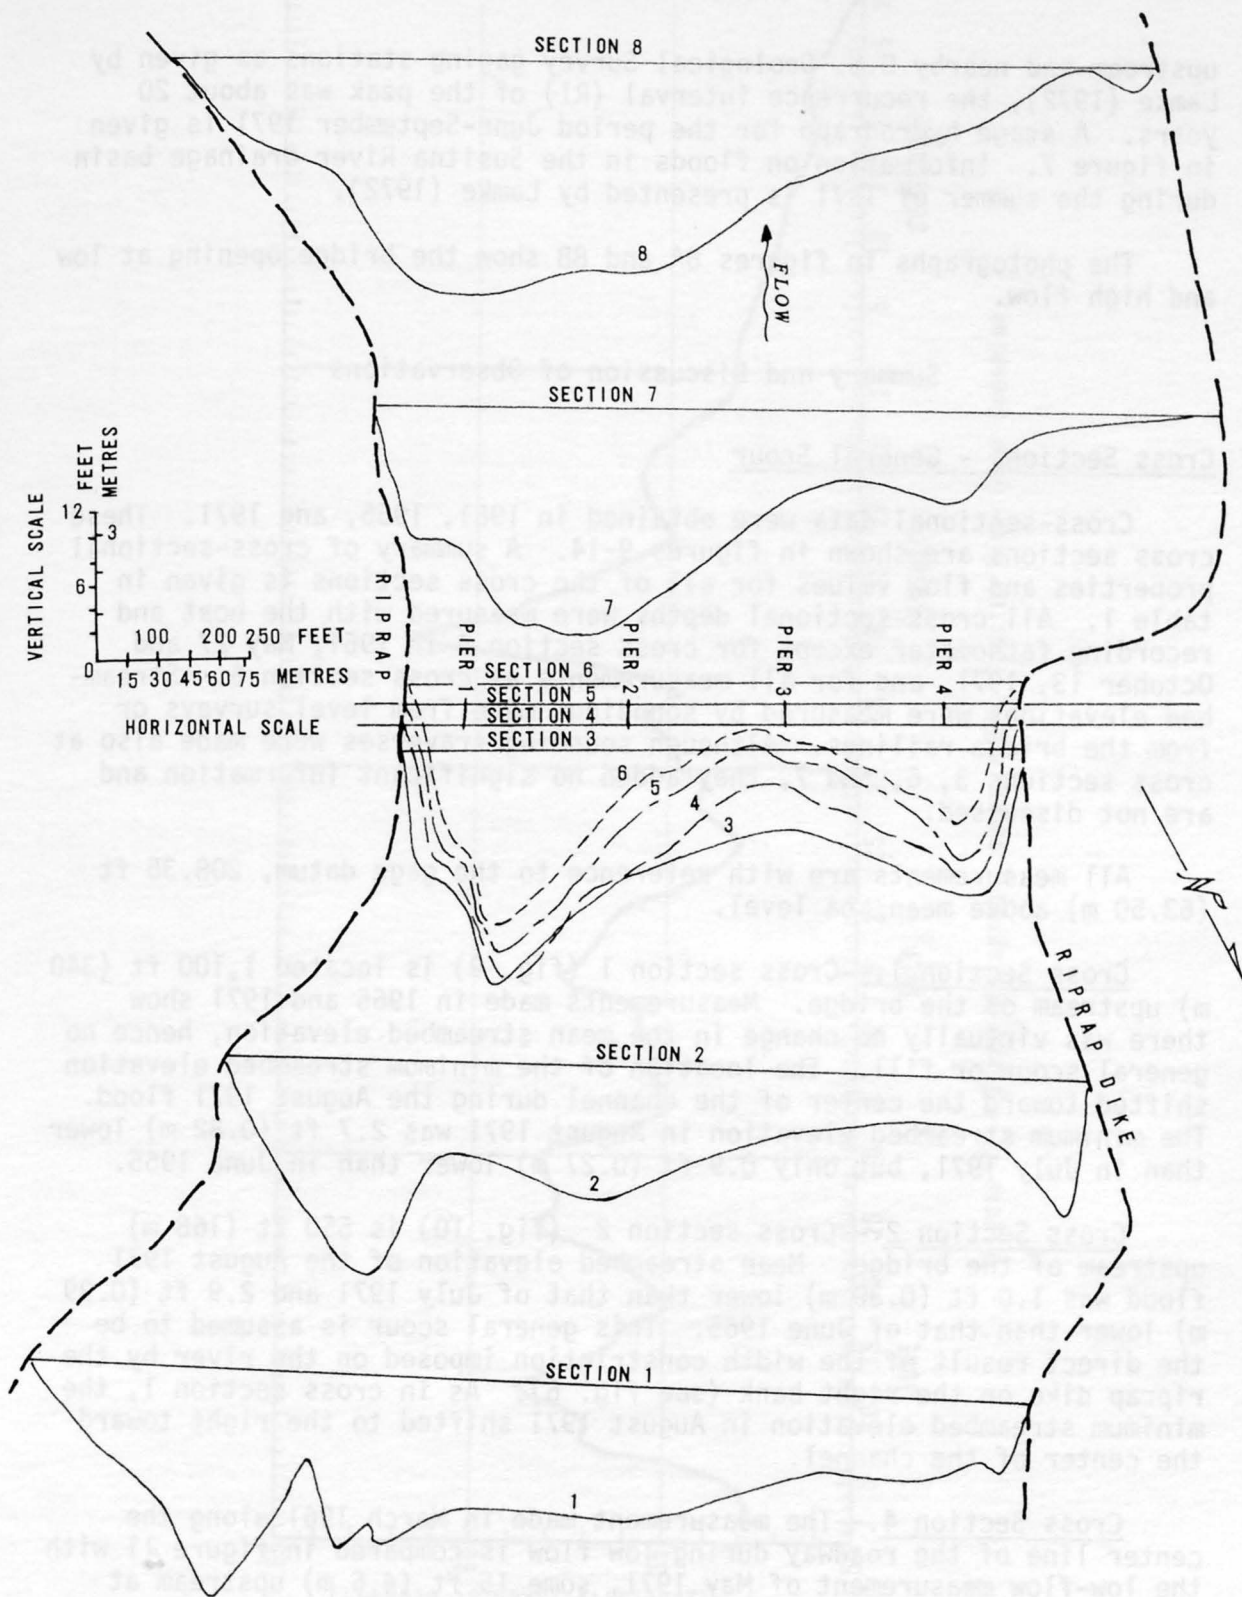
Location and general shape of cross sections, Susitna River near Sunshine.
